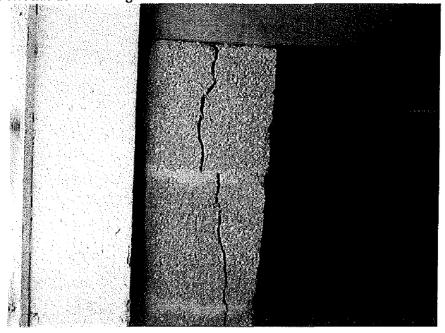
View of cracks in the foundation wall on the east side of the building.
